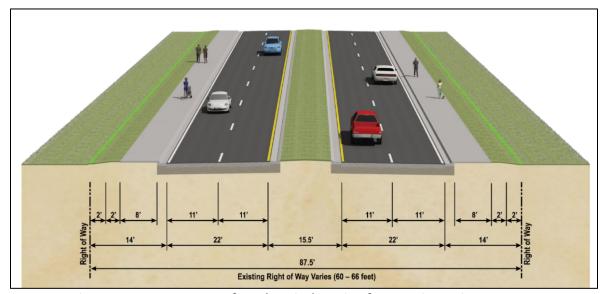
Segment 8 Preferred Typical Section from LaVista Drive to SR 17.
